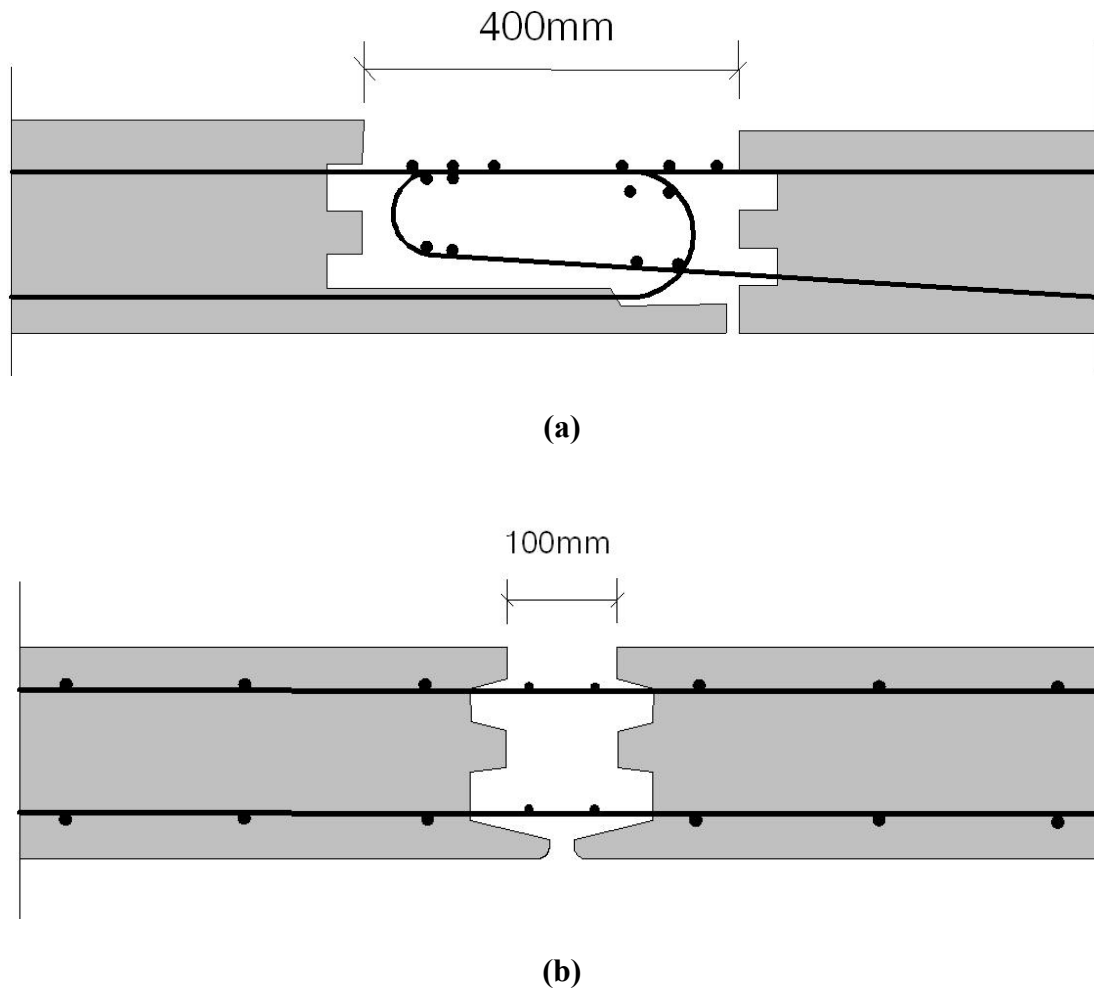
Joint between Prefabricated Slab casted with (a) Normal strength concrete (b) UHPFRC. Adapted from Harryson (2008).
